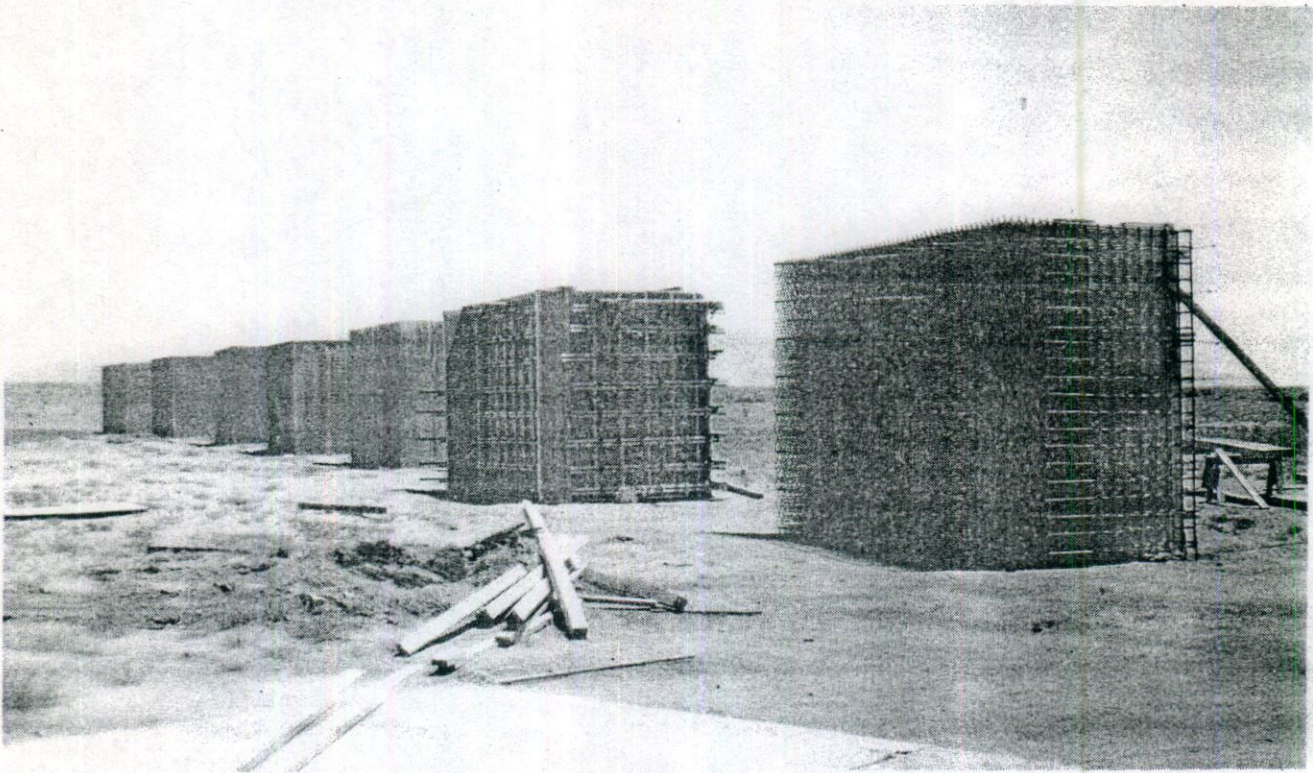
Thick Reinforced Concrete and Expanded Metal-Concrete Walls during Construction
